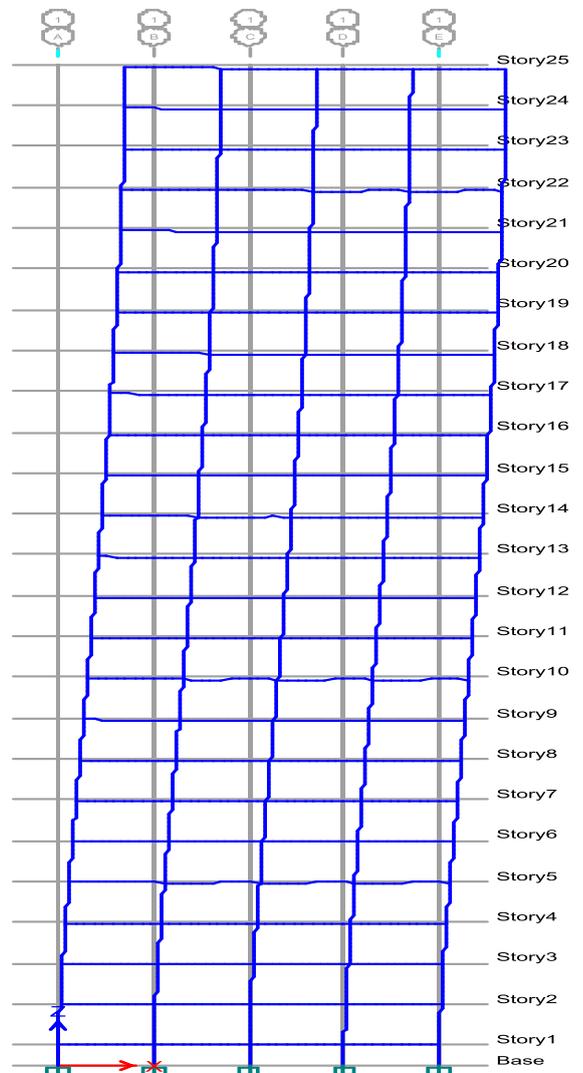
(c) Elevation of Model-H (First Mode Shape)
